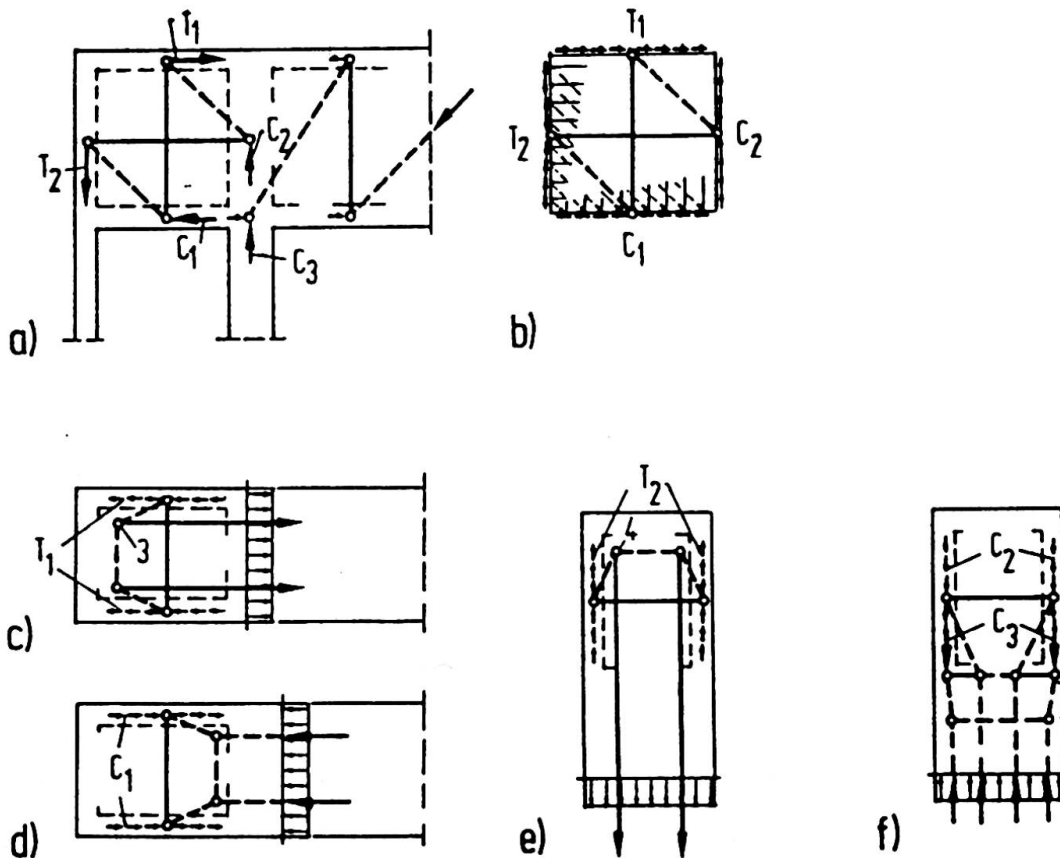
Strut-and-tie models for the structure with internal diaphragm wall. a) Basic model for the web. b) refined model for the web with smeared forces. c) Top flange. d) Bottom flange. e) Tensile wall. f) Compression wall
